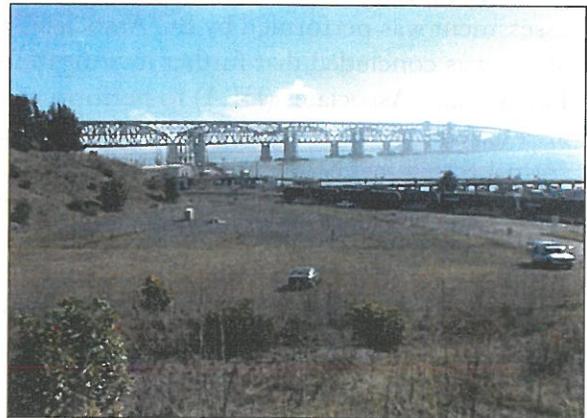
Looking southeast at the grade flat area of Fillsite 2. Carquinez Strait in background. Photo taken March 2001.
